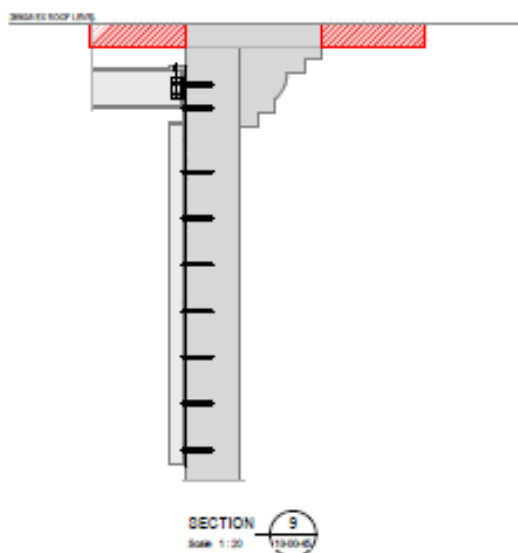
Section detail showing in red hatching, the proposed extent of demolition and the remaining section of existing slab over the George Street wall and over the decorative cornice. (Source: TTW drawing number -ST-285-10-00-60, issue C 27.03.2019)
